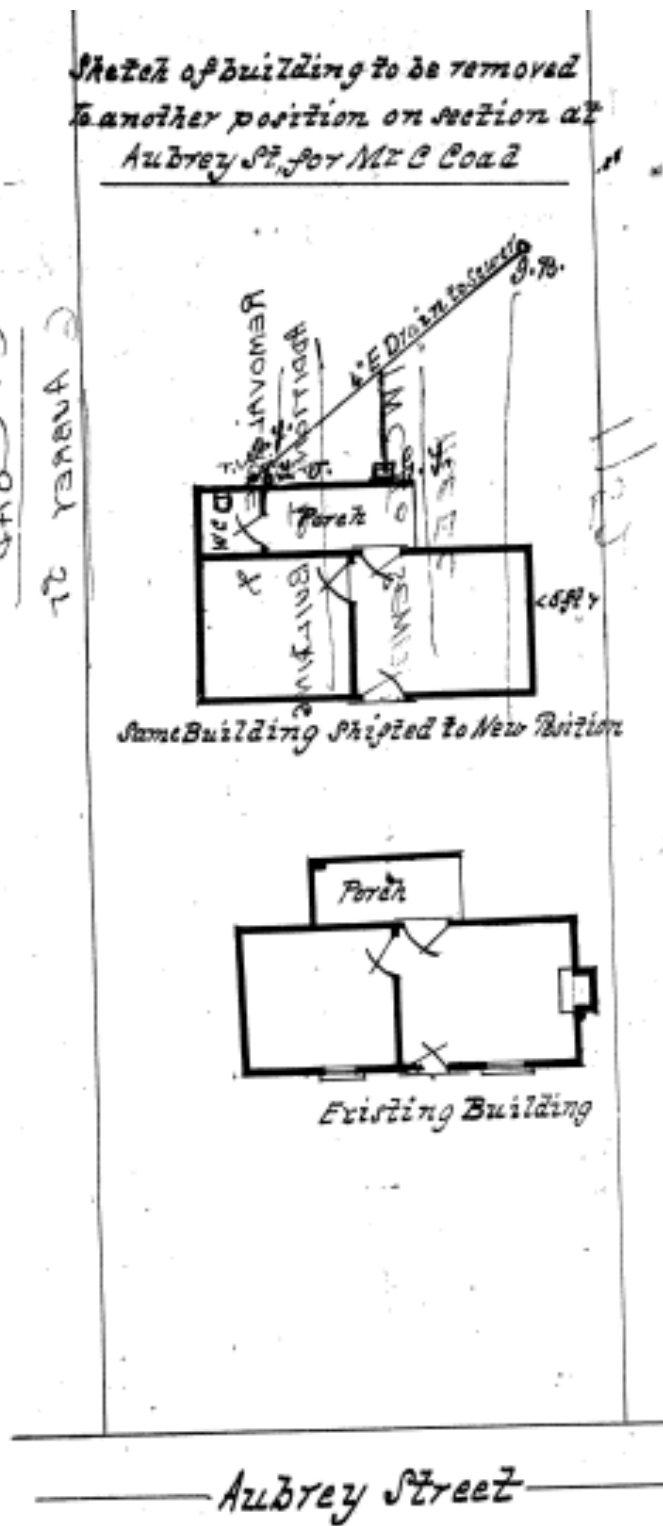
Detail showing 1933 plans for shifting cottage at 6 Aubrey Street further towards north of site. (NPDC Property File for 6 Aubrey Street, 1933).
